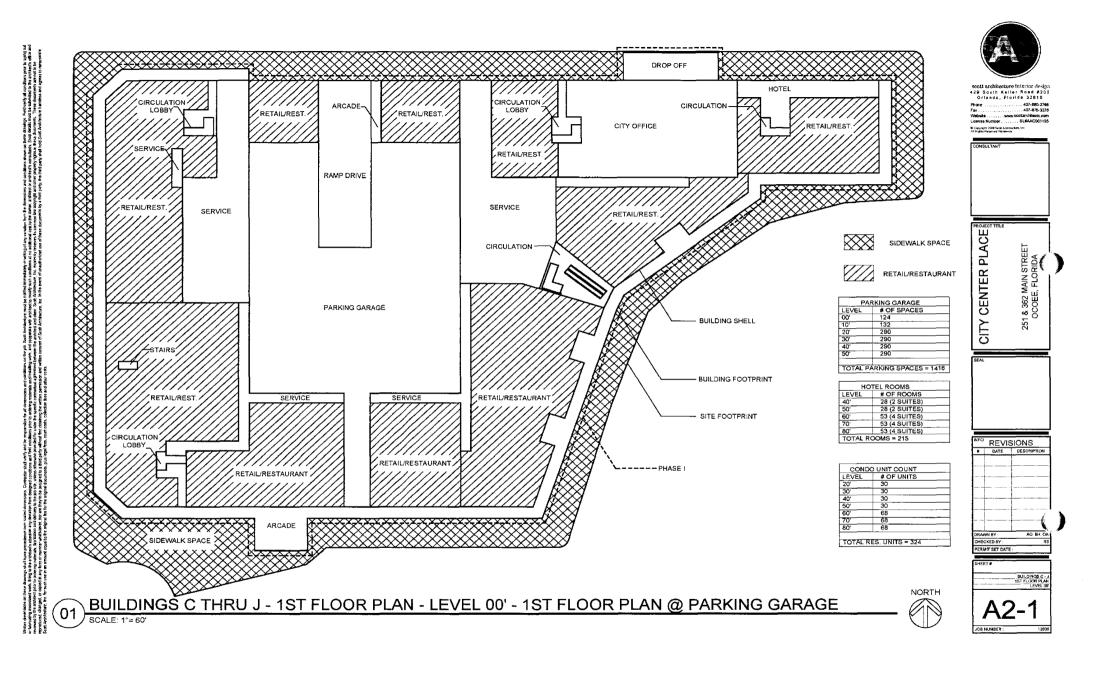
#### EXHIBIT A – PROJECT RENDERINGS, SITE PLANS, CONDO UNIT FLOOR PLANS
